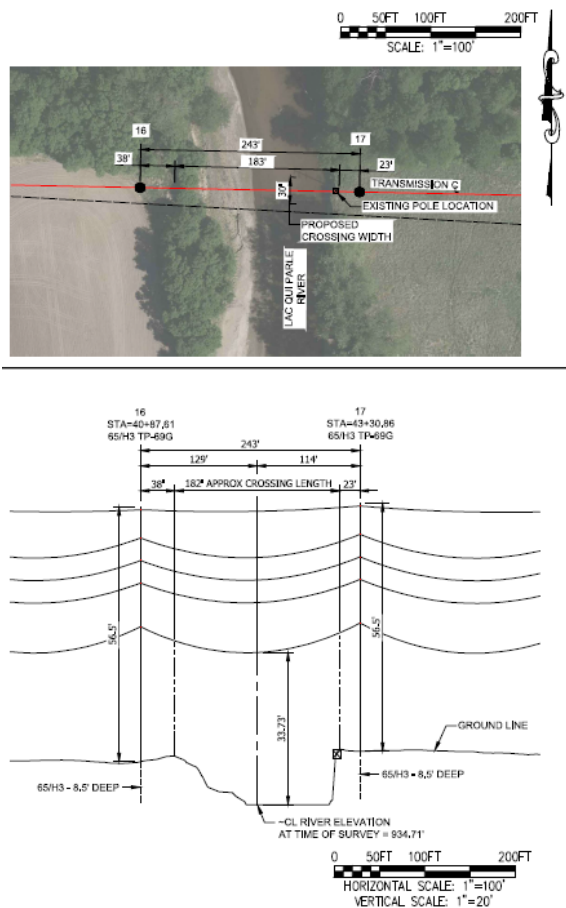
Example 2 of Aerial Map, Plans and Cross-section on one page – Boring under water
